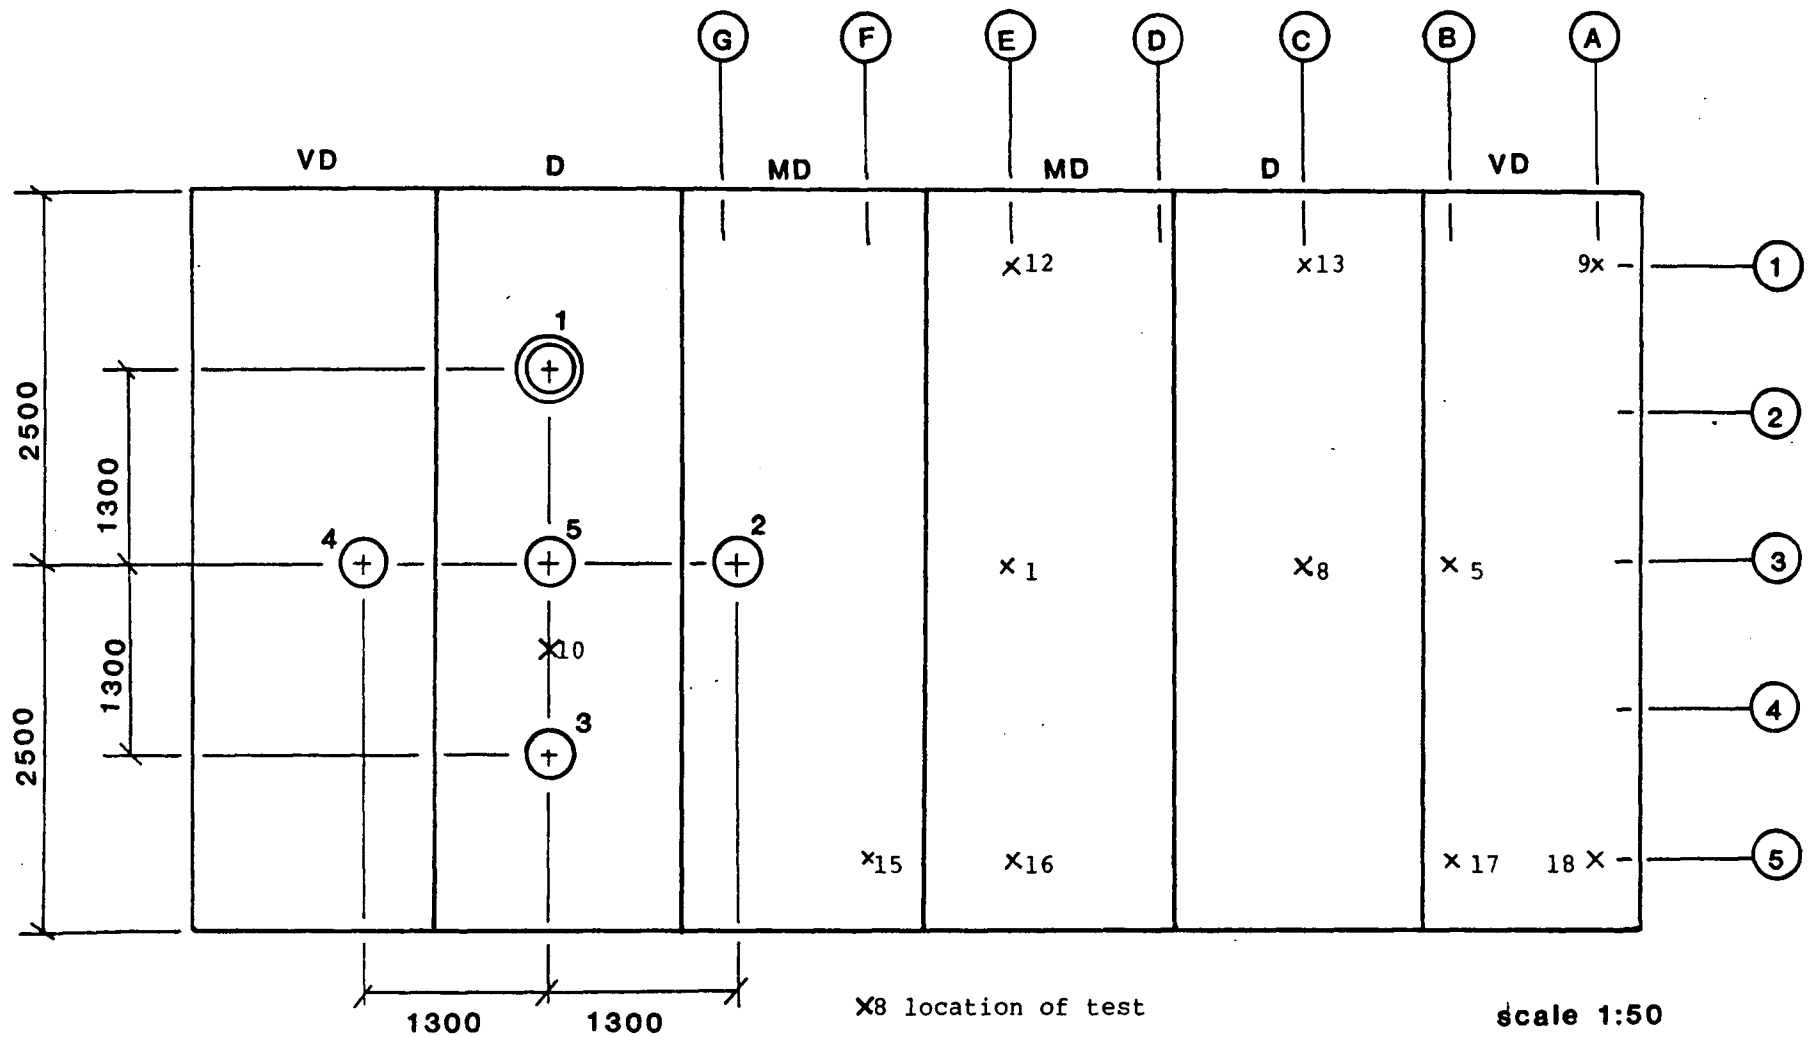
LOCATIONS OF IN-SITU TESTS PERFORMED AT UBCPRS
